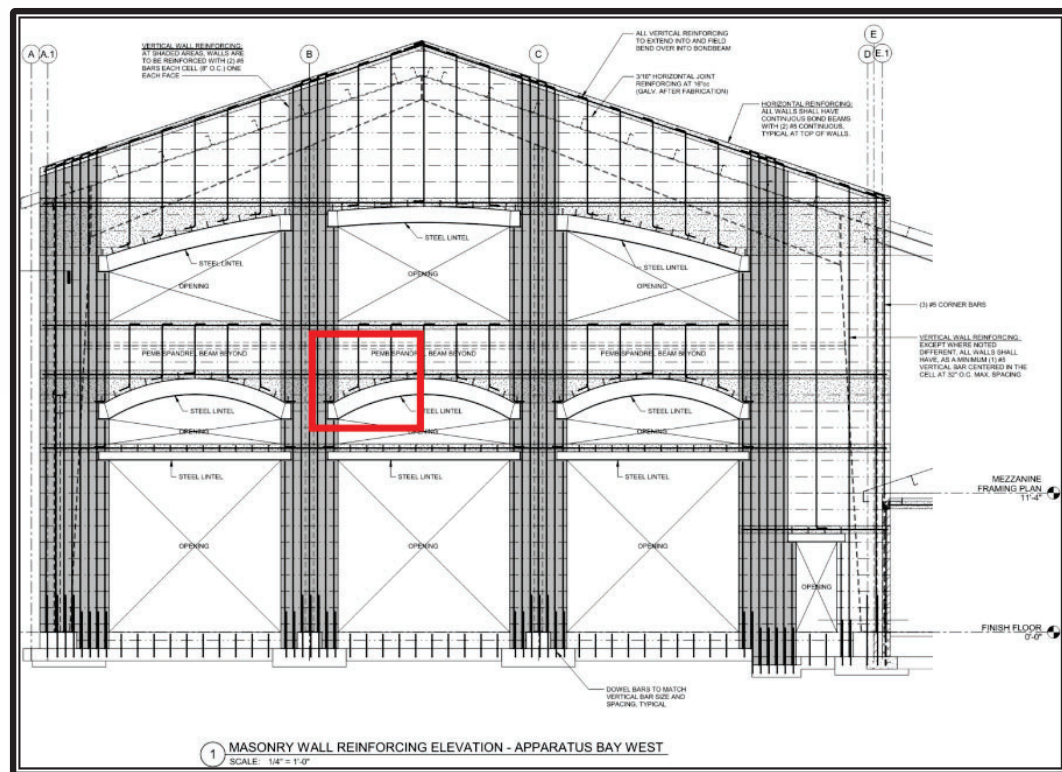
CMU wall elevation showing the approximate location of Test Area 5 (outlined) (cropped plan courtesy of T&V).
